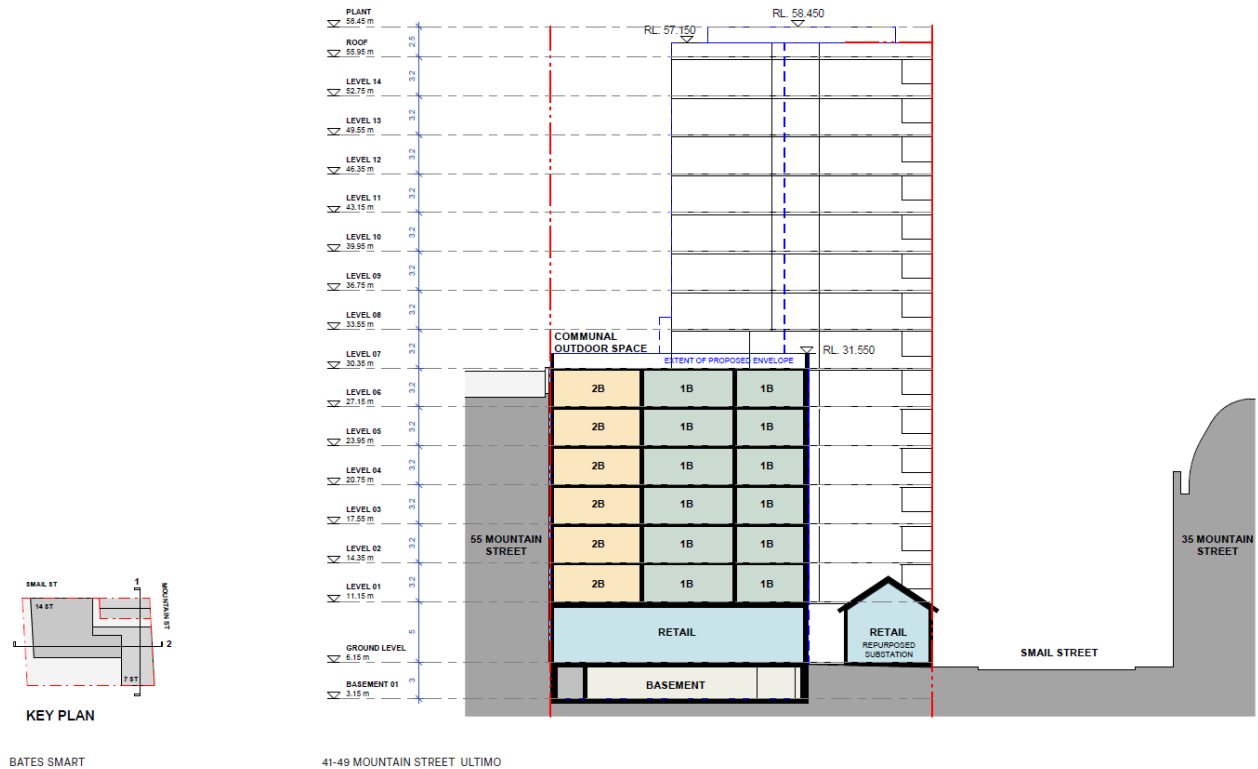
Extract of concept plan showing section 1 facing towards Mountain Street site frontage.
